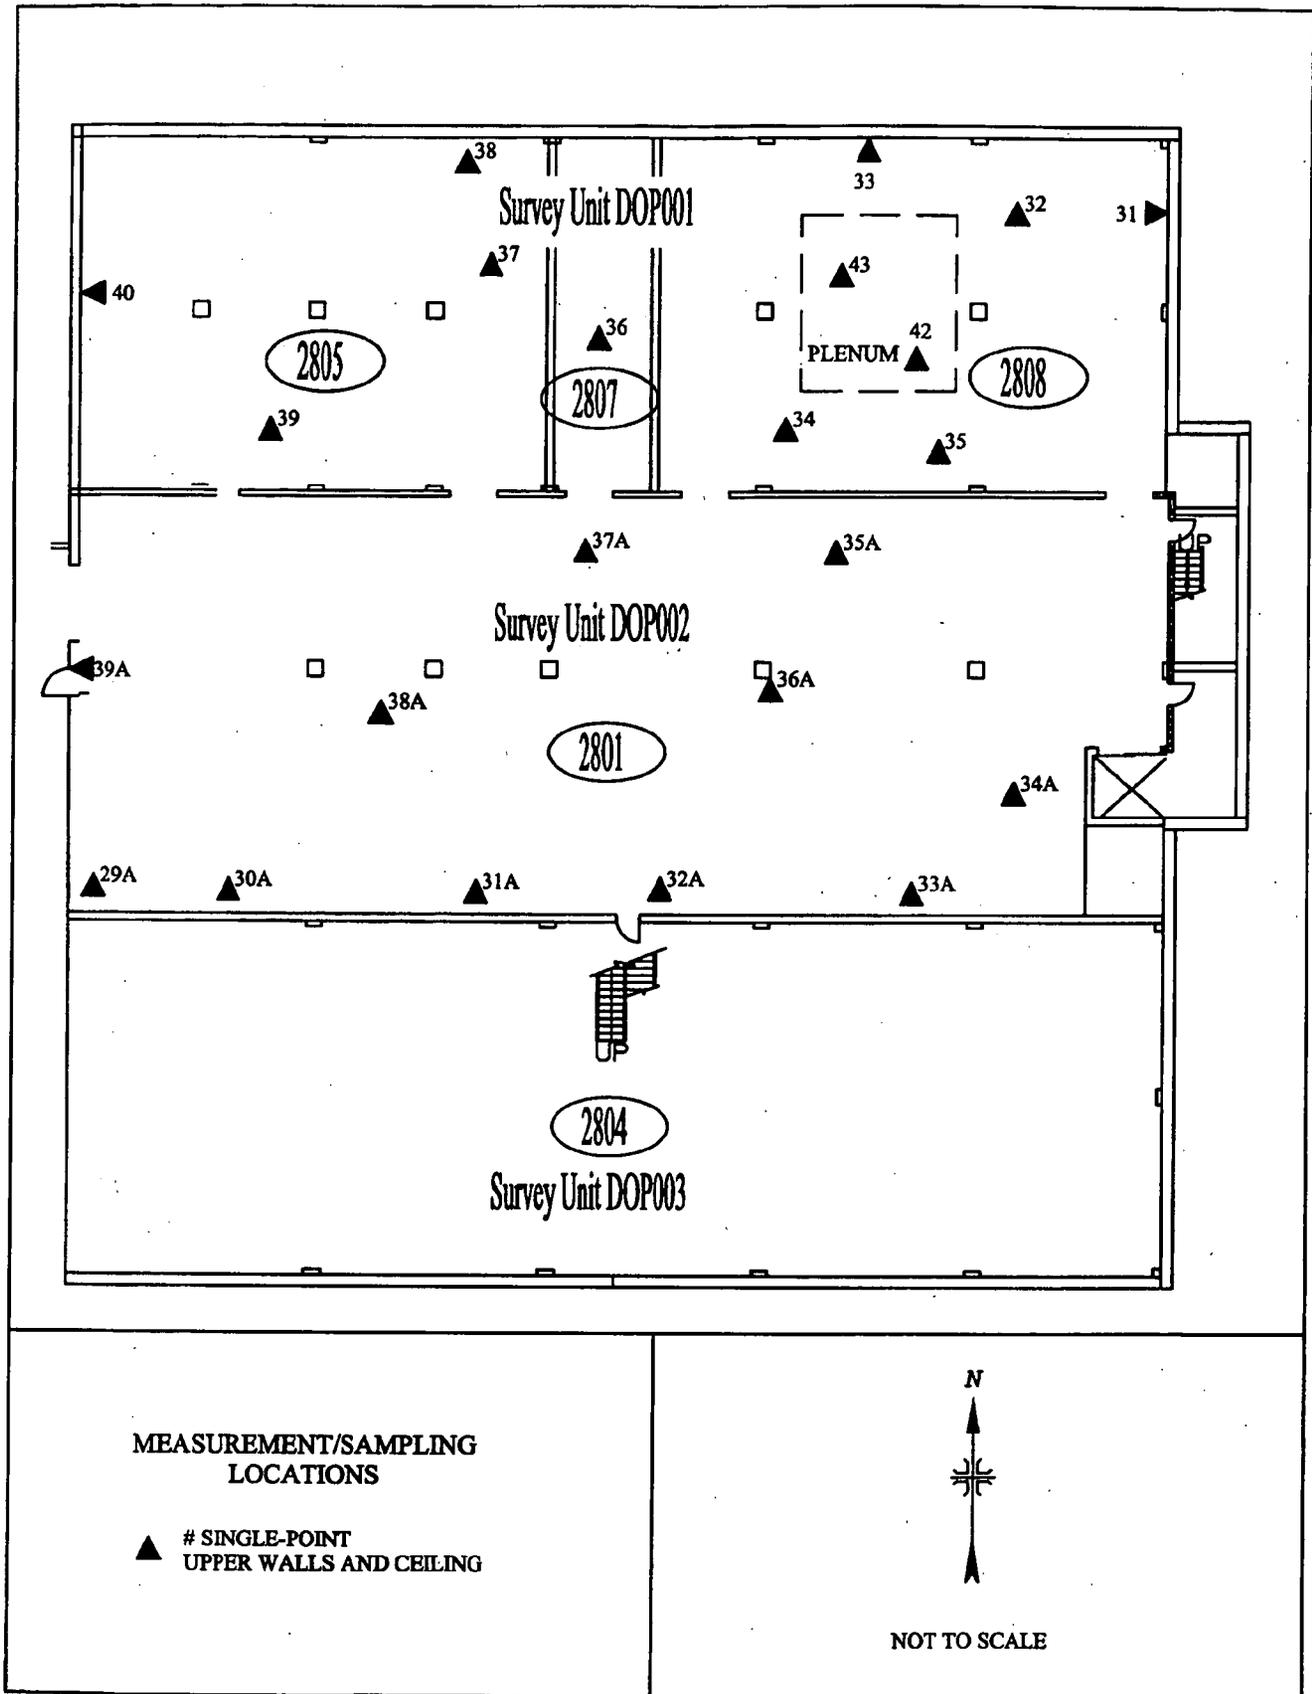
DOP Area Upper Walls and Ceiling - Measurement and Sampling Locations
